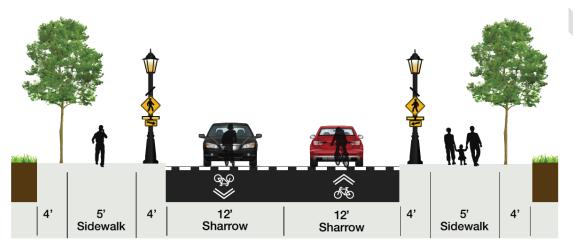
Pine Grove Road Cross-Section with Enhanced Pedestrian Crossing
